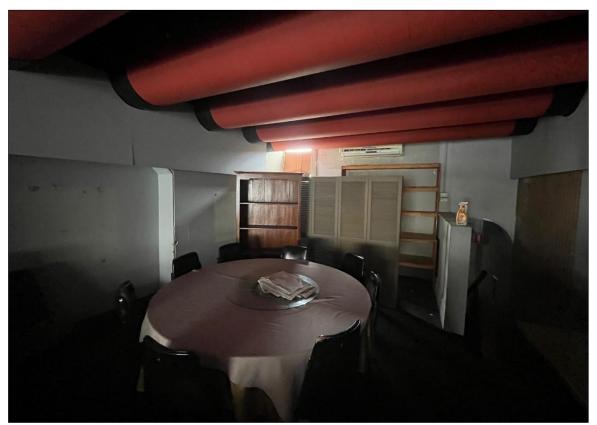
Restaurant interior – first floor dining area toward stairwell landing on the right hand side (RCC Site inspection, Nov 2024)
